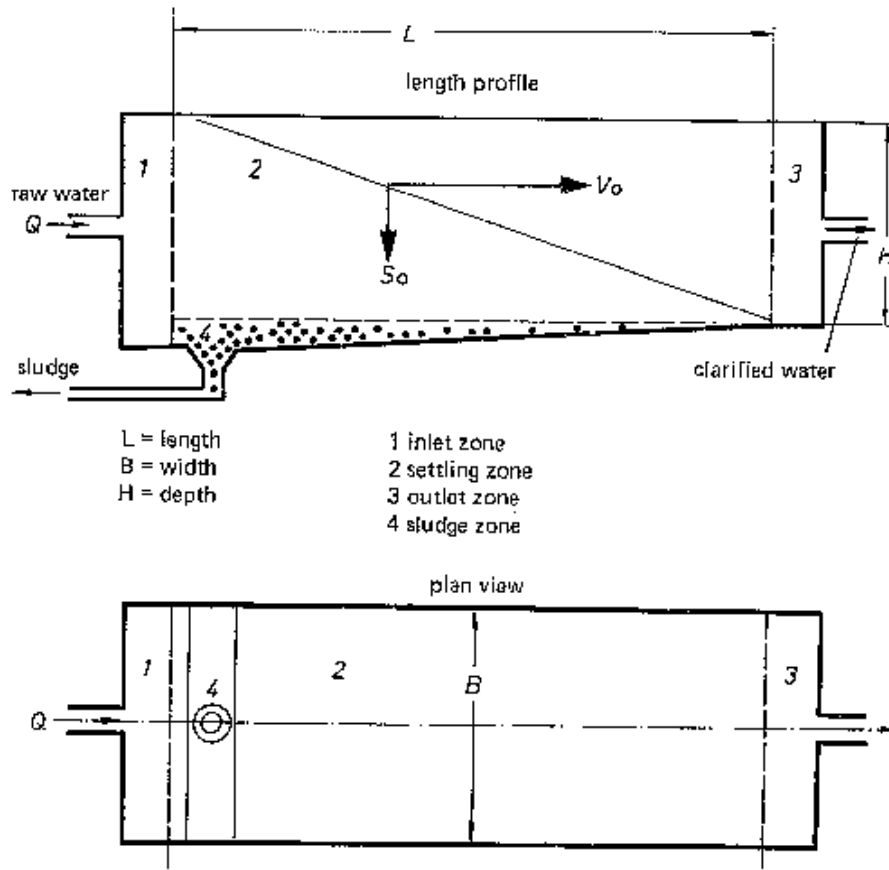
Plan and Cross Section of Sedimentation Tank[12]
